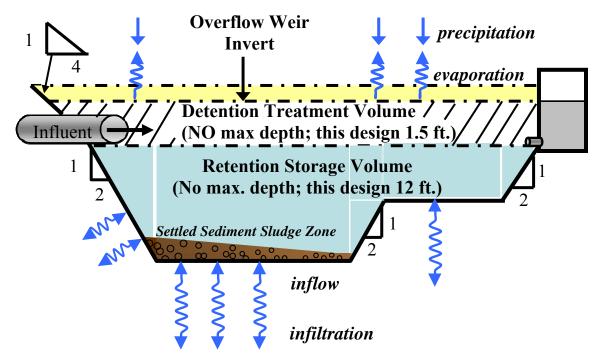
G.3-1 Longitudinal Section of FAA 1:1 and 10:1 Ponds (NOT TO SCALE)
